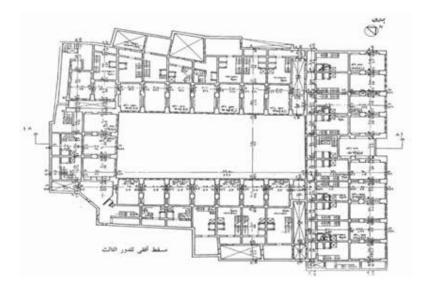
Wekalet El-Ghouri typical floor plan. (Fahmy et.al,2019).
